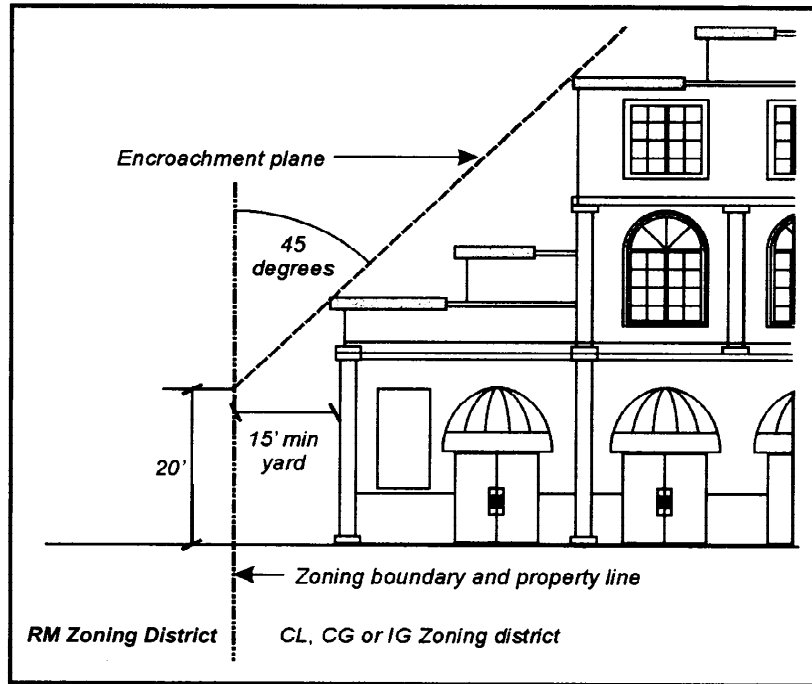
Encroachment Plane Requirements for Projects Abutting an RM-16, RM-32, and RM-48 Zoning Districts
